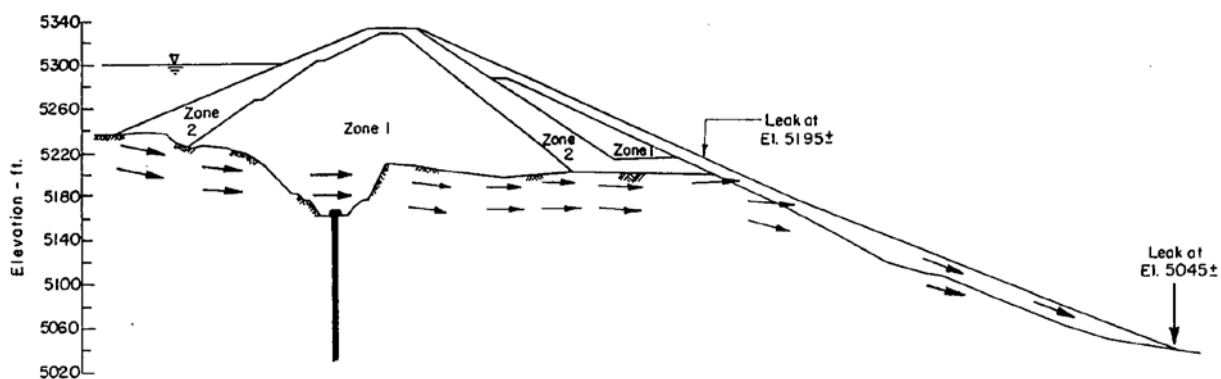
Postulated path for seepage through the abutment cutoff trench (Independent Panel to Review Cause of Teton Dam Failure 1976).
